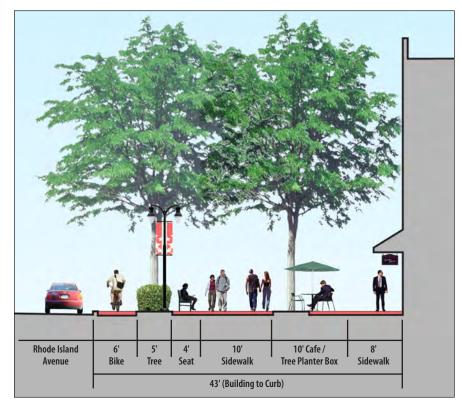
PROPOSED CONDITIONS—NORTH SIDE OF RHODE ISLAND AVENUE, LOOKING WEST.
